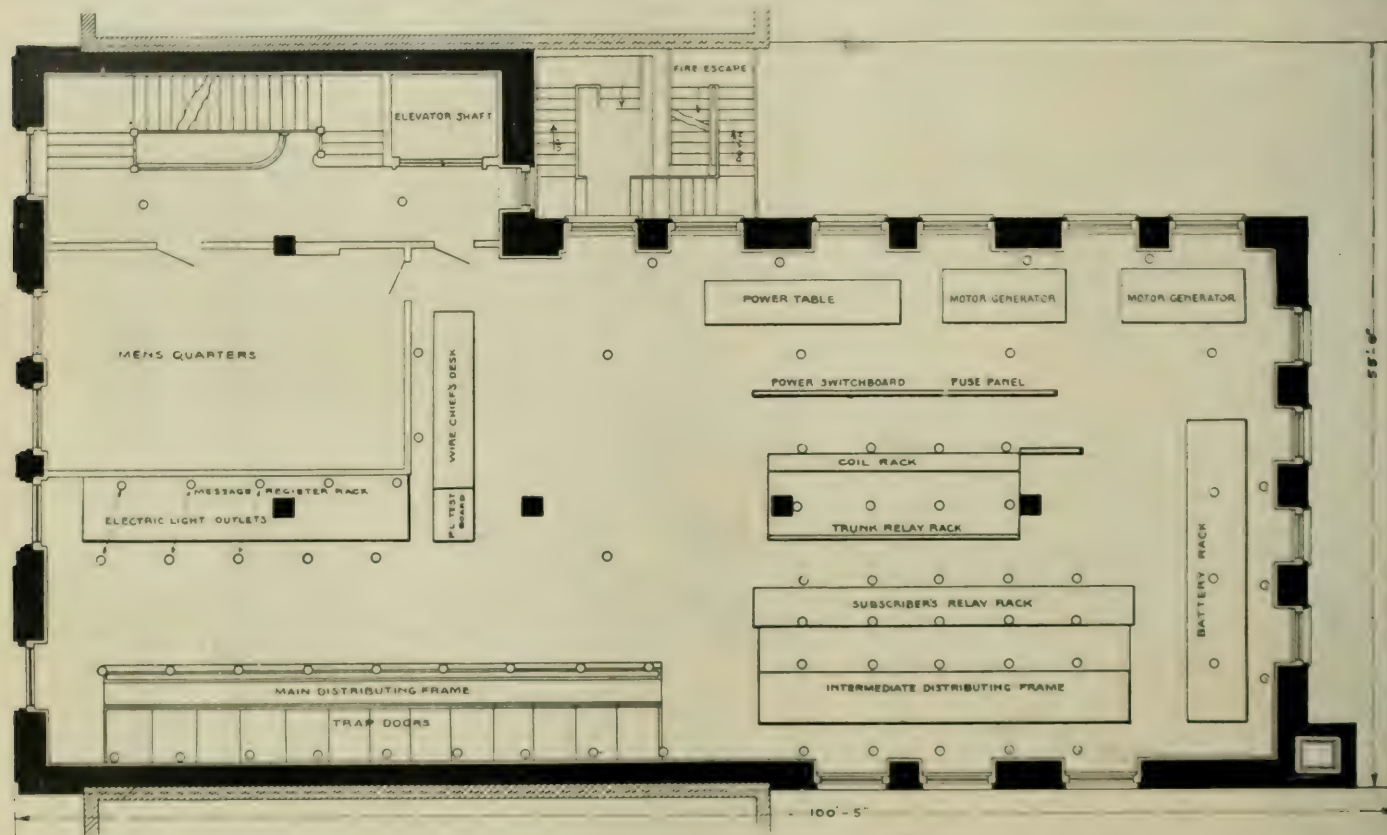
SECOND FLOOR PLAN, PLAZA CENTRAL OFFICE.
